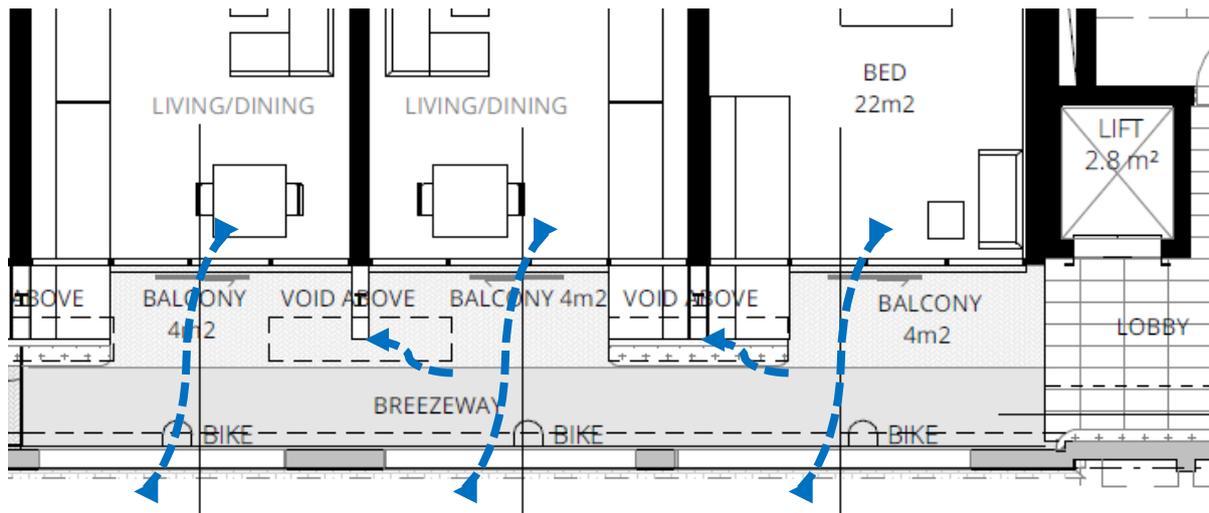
On Level 2, reliance on new penetrations in the principal facade and air movement across the common breezeway and through voids to Level 3 for natural ventilation and cross ventilation.
